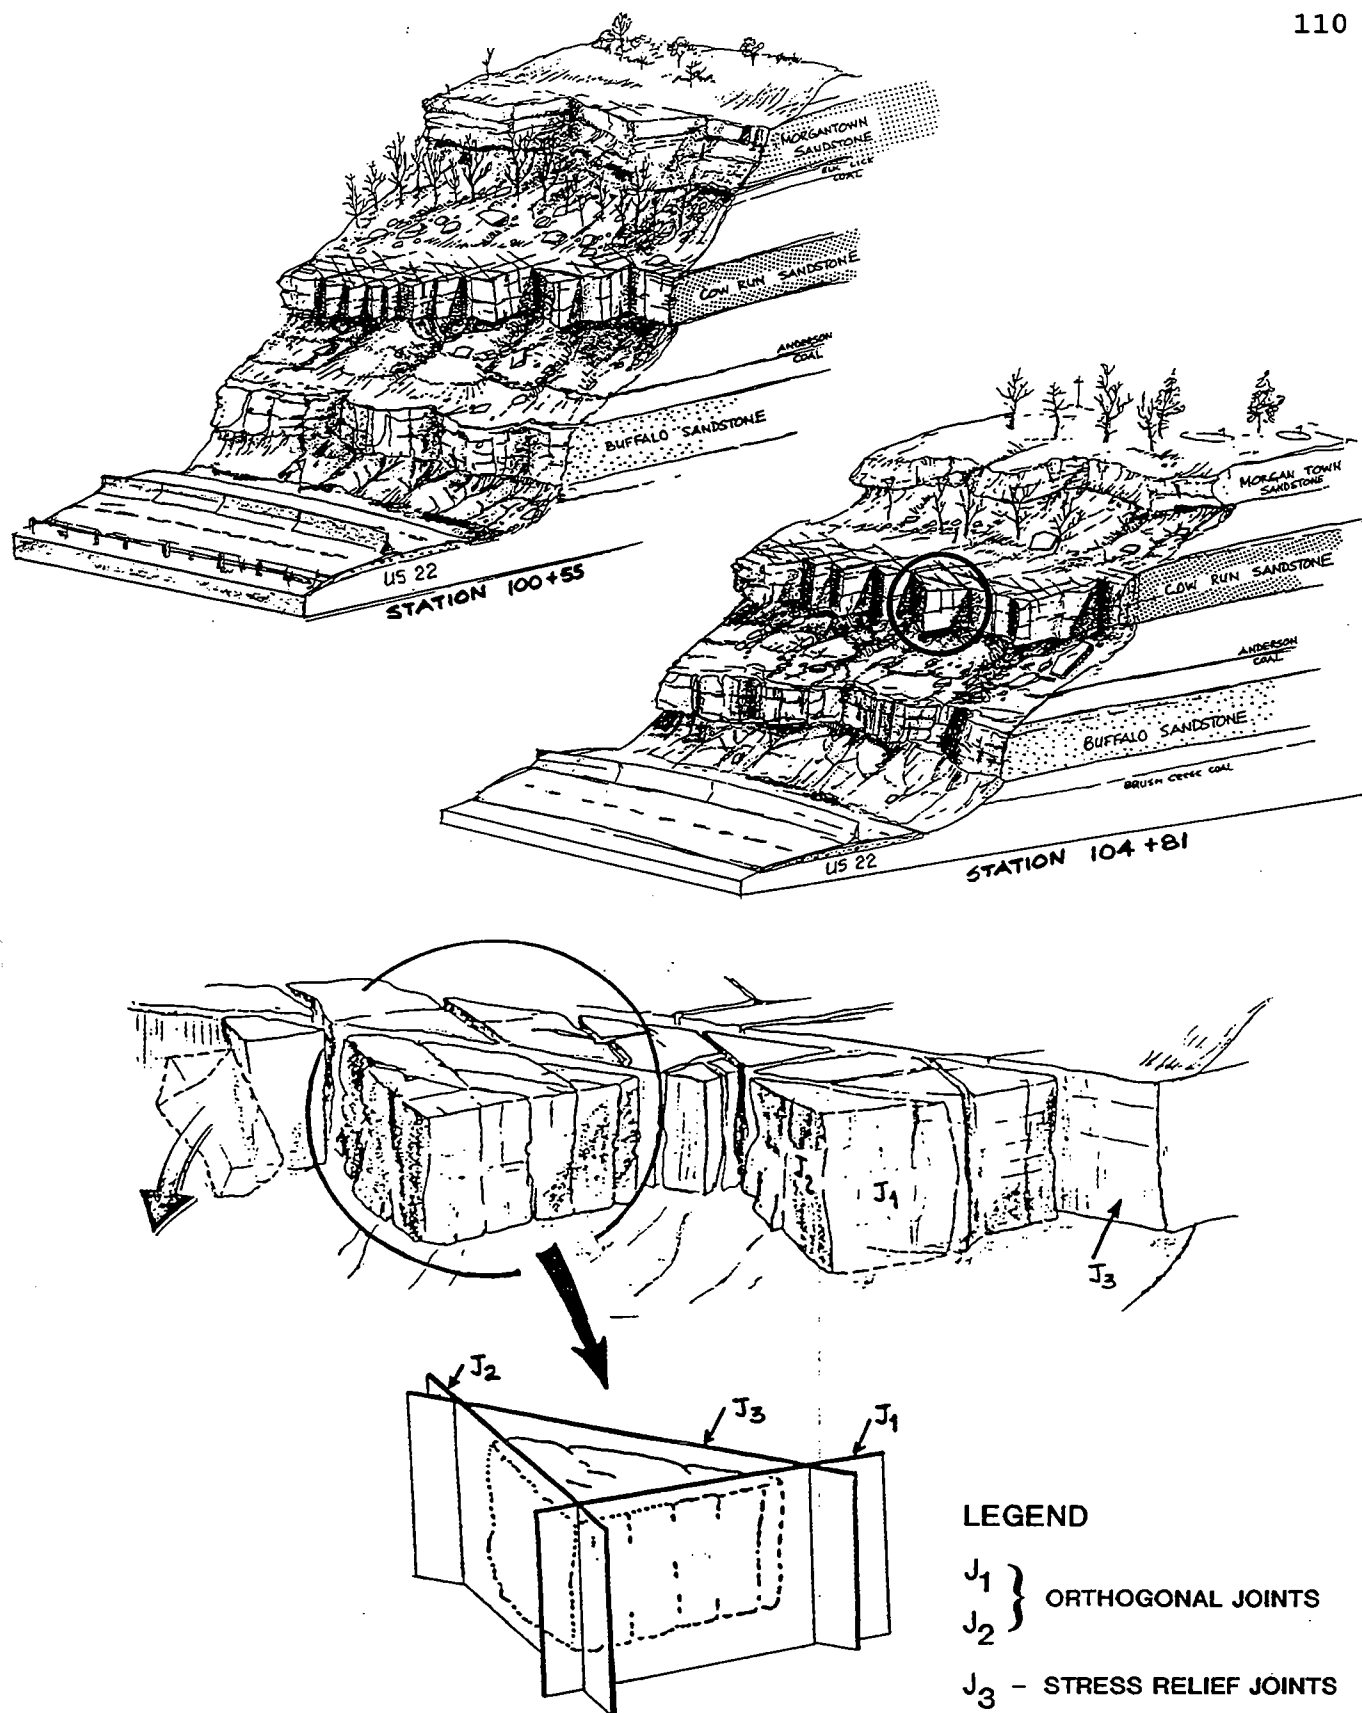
SCHEMATIC OF ROCK STRUCTURES AT PROJECT SITE.
